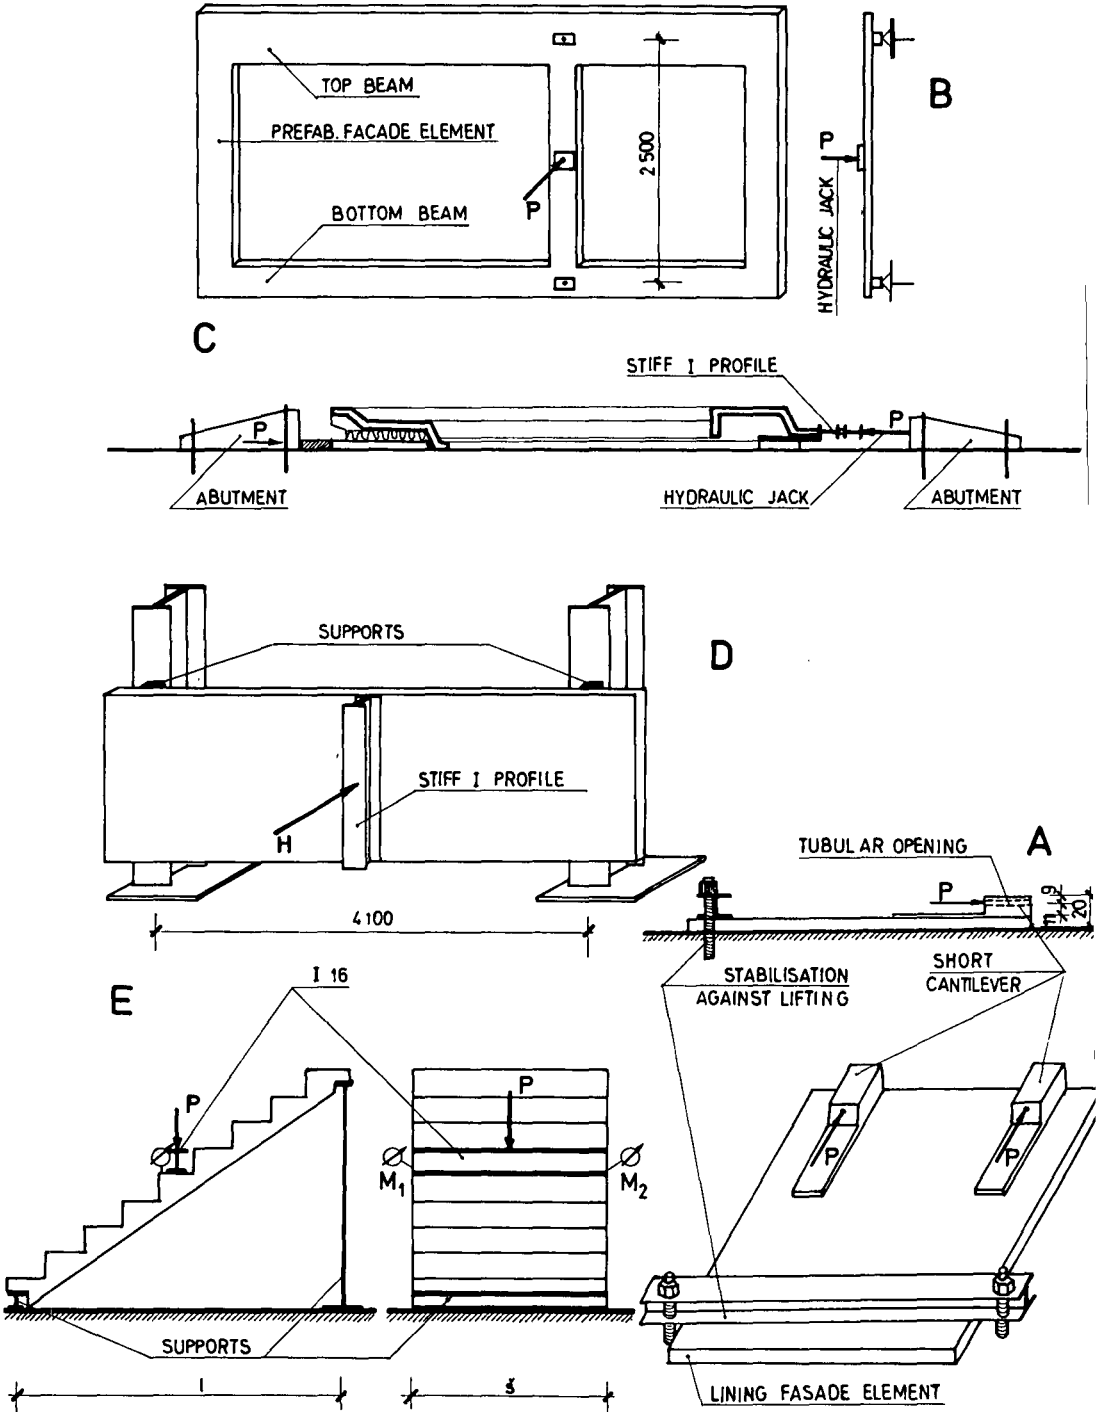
TESTS ON STRUCTURAL ELEMENTS
